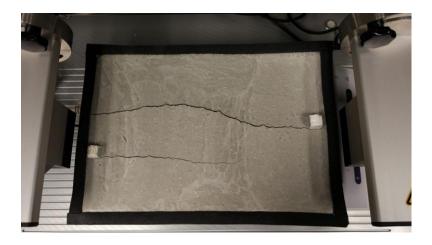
Pre-setting cracks in horizontal surface of mortar mix (CEM I and limestone)
